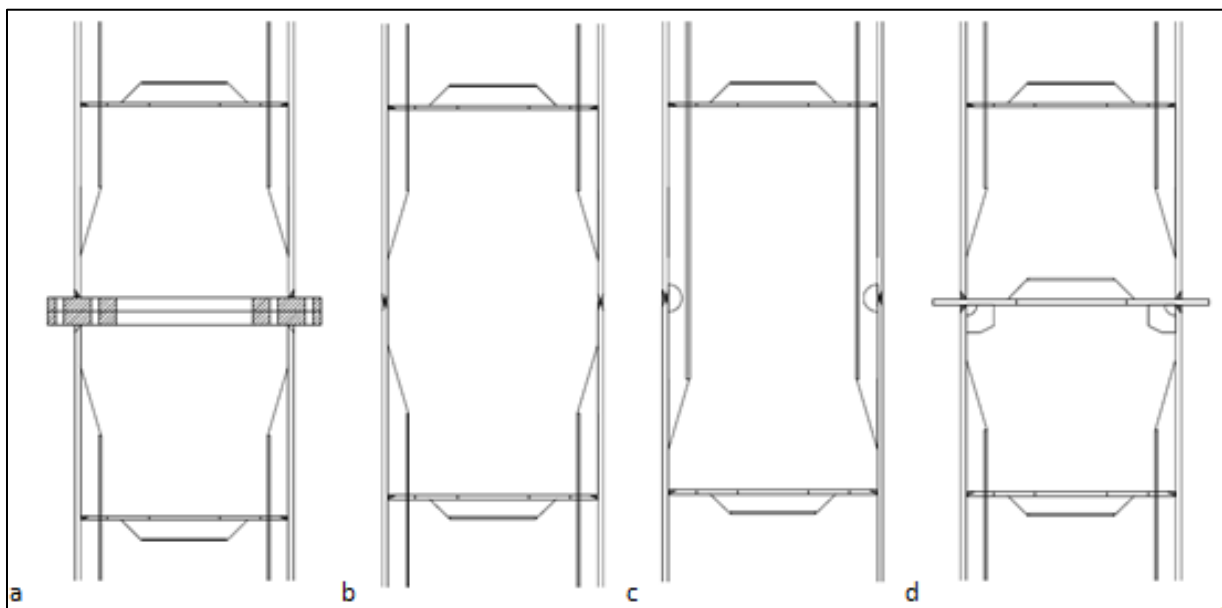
Sectional view a) Bolted flange plate connection b) Welded connection without flange plate (no lengthening of length stiffeners) c) Welded connection without flange plate (lengthened length stiffeners) d) Welded flange plate connection
